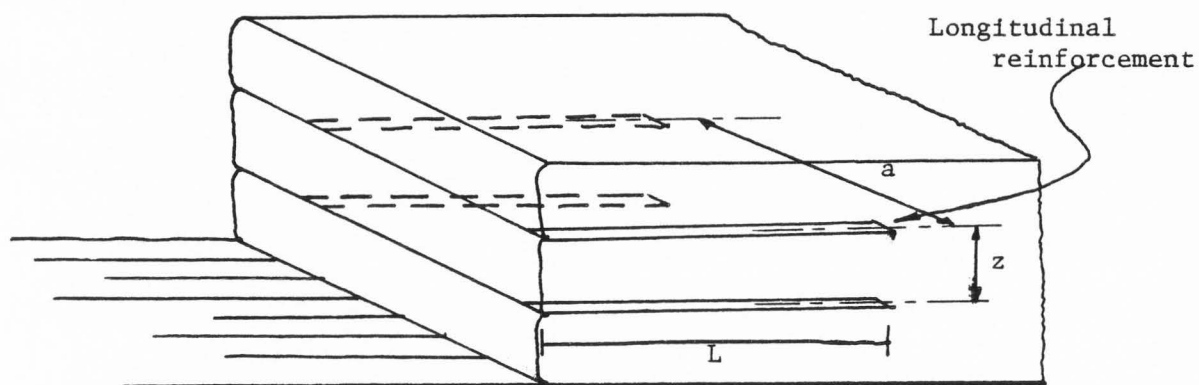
Isometric view of reinforced soil construction with longitudinal reinforcement only--typical of Reinforced Earth structures.
